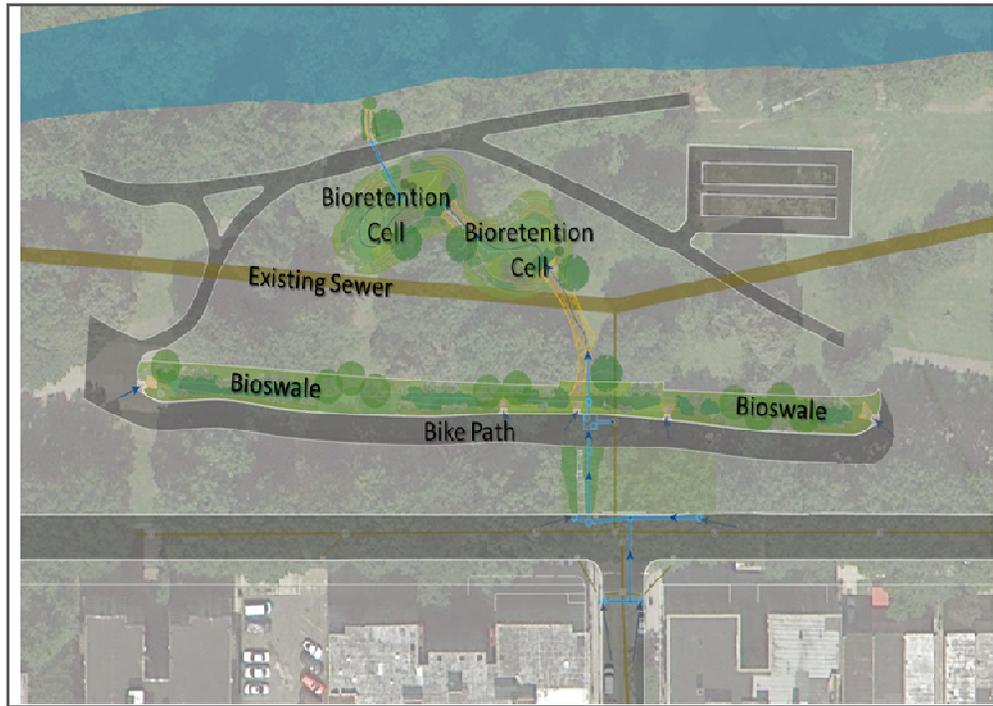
Pilot-Bioswale Installed in Brooklyn, New York
